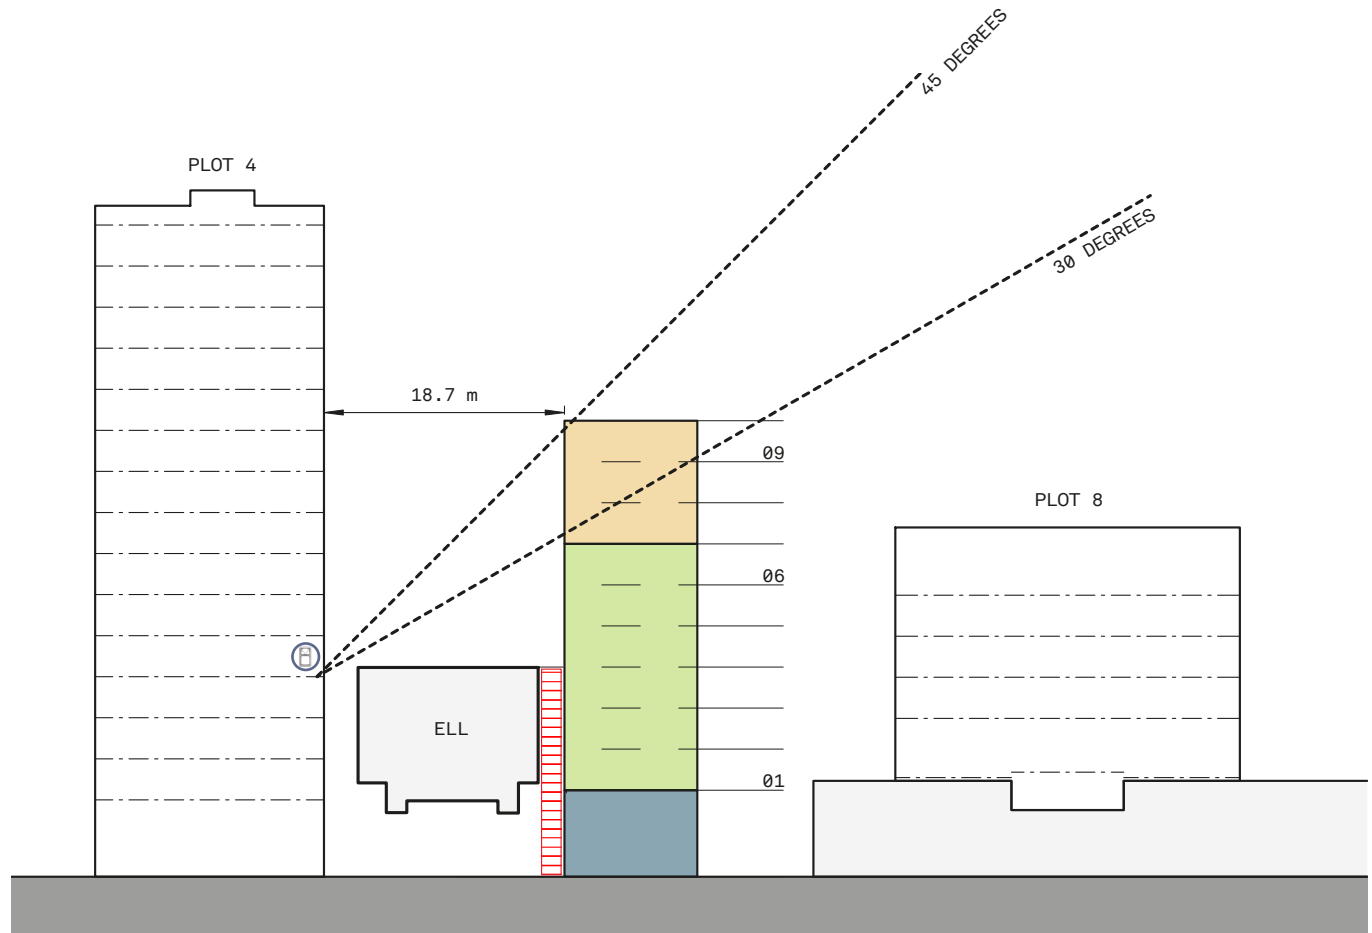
Section 1-1, demonstrating maximum building envelope (section) without affecting daylight amenity of plot 4
